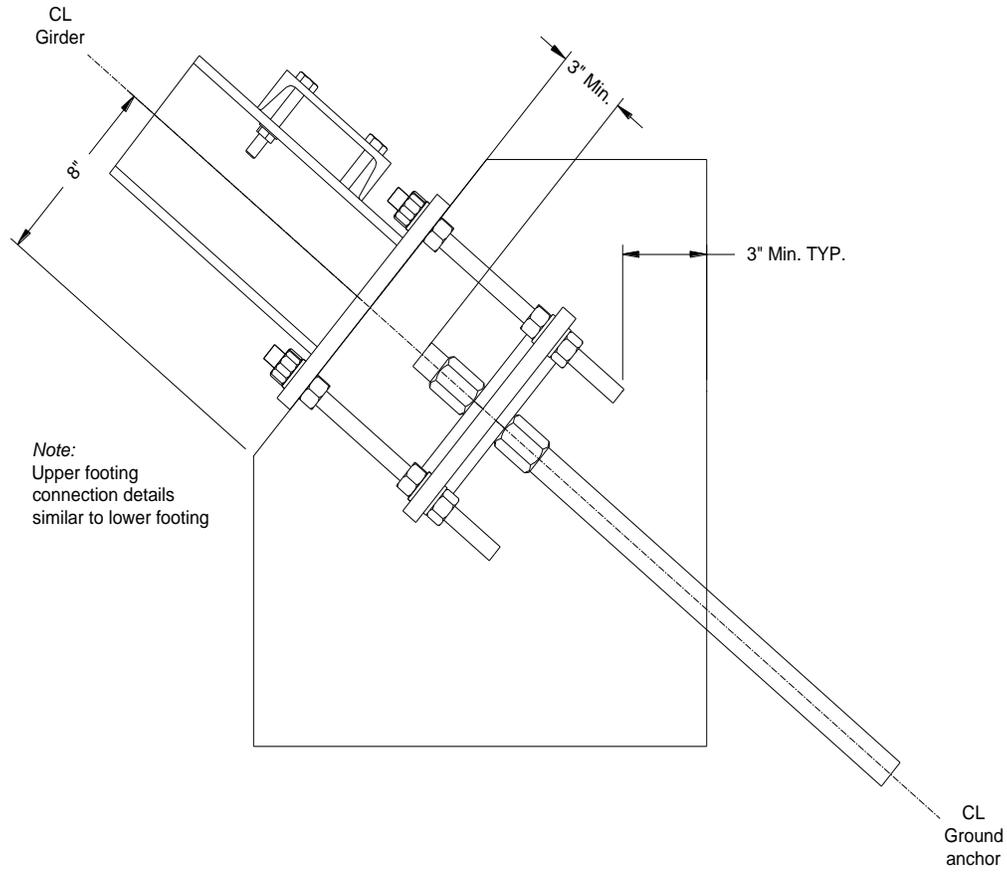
Snow supporting structure upper girder foundation and connection to ground anchor for case of CIP footings.
